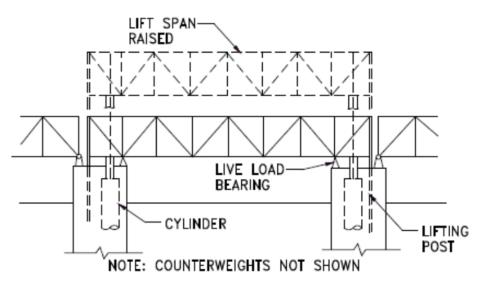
Pit drive vertical lift bridge (Berger et al., 2015b)
